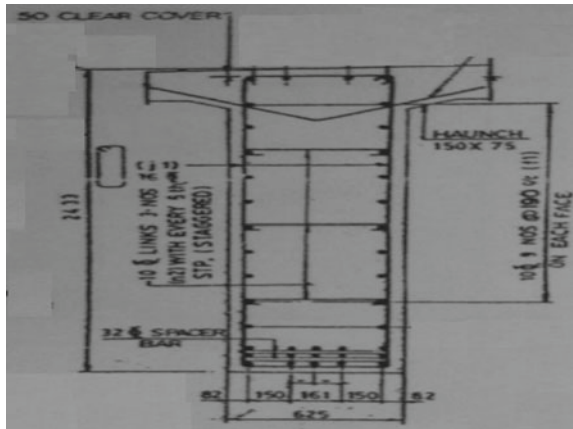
Cross-section of T-beam bridge girder for 24 m span
